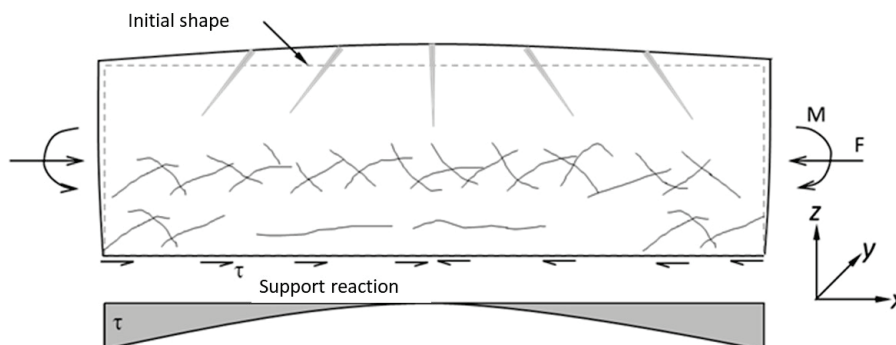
How the supporting slab affects the crack formation in a homogenous concrete wall
